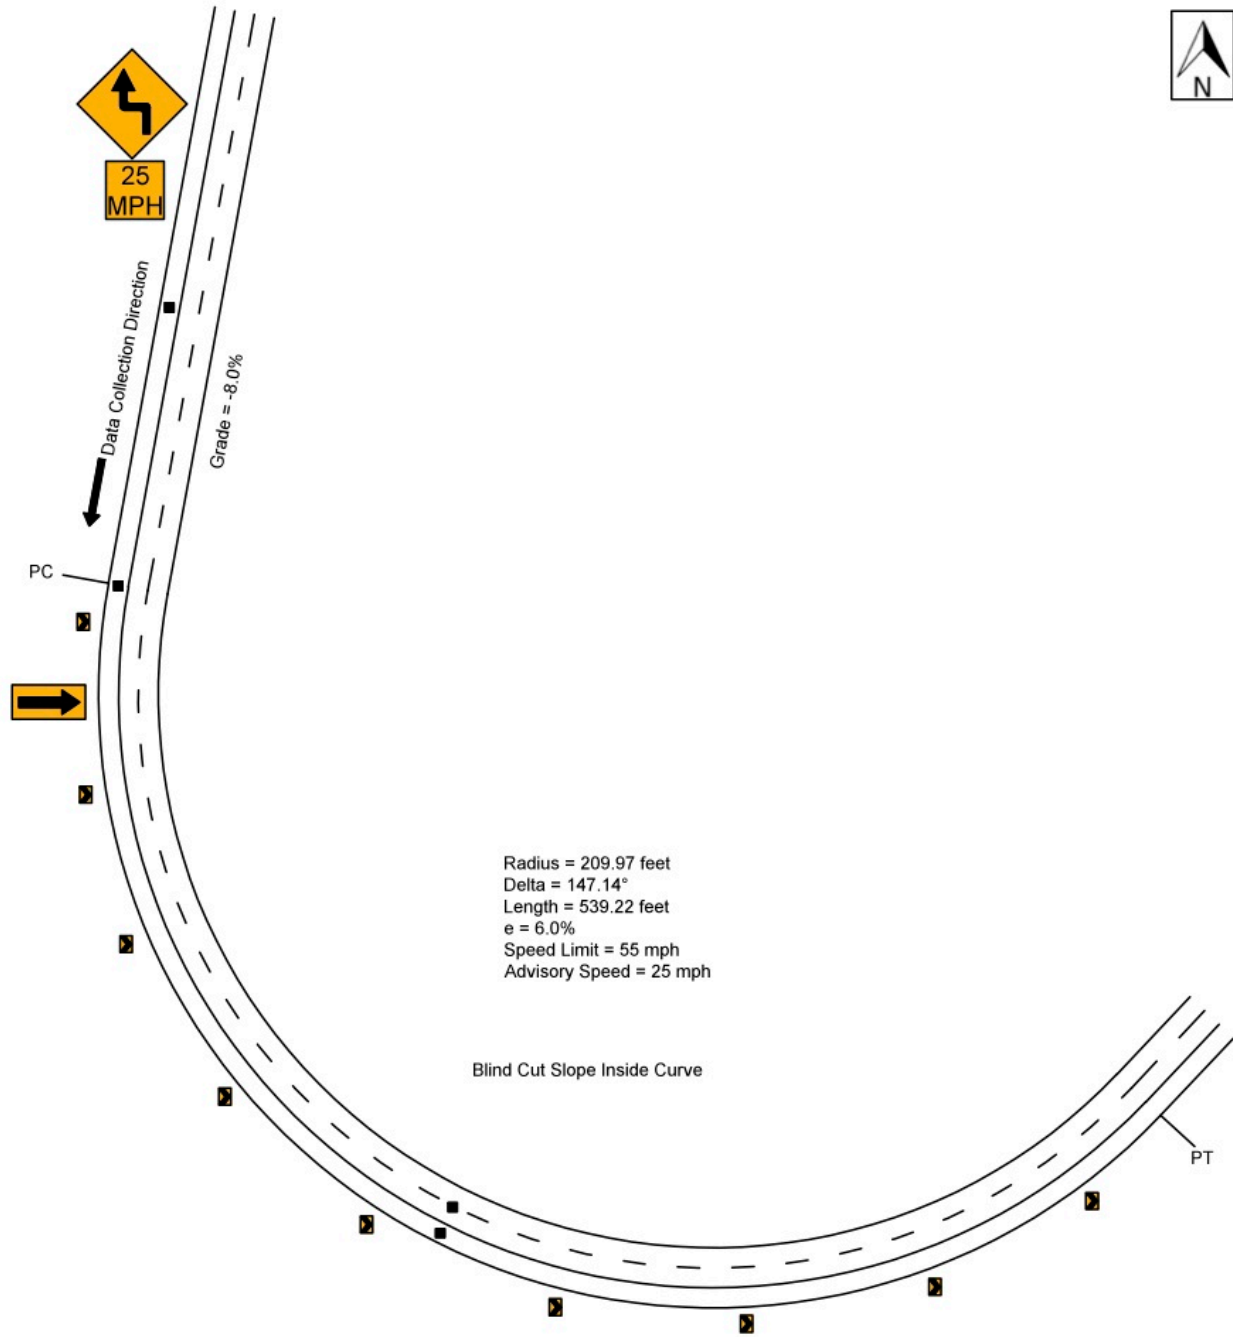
Diagram. Geometric layout of the U.S. Route 33 treatment site (not to scale).
